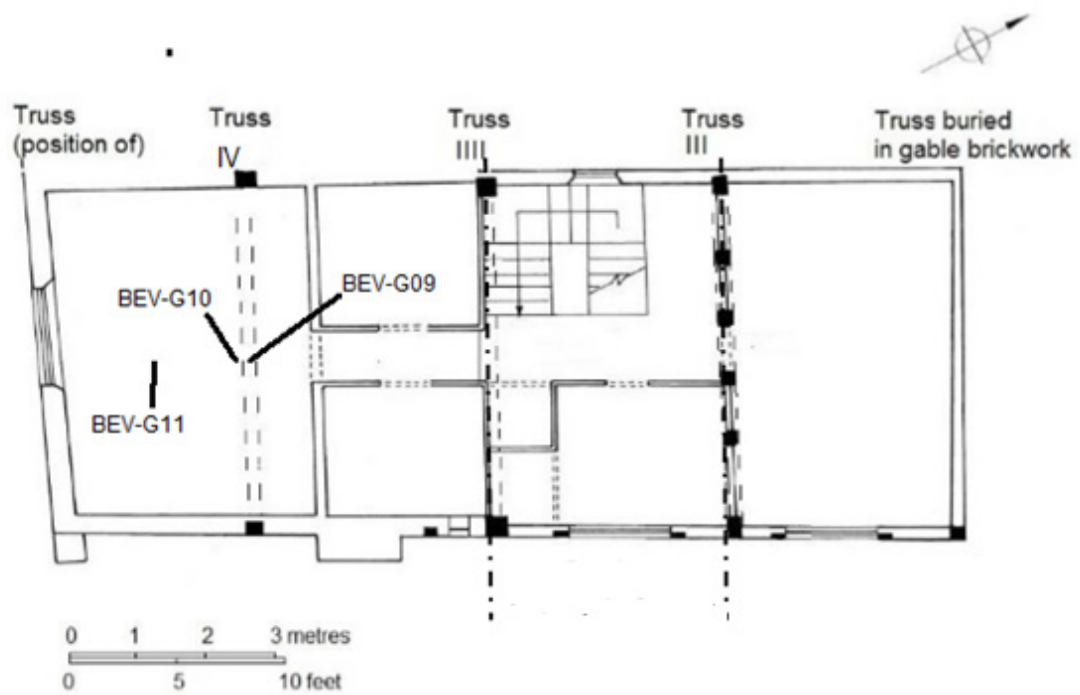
First-floor plan, showing truss positions and the location of samples BEV-G09–11 (YVBSG 2015 based on Ed Dennison Archaeological Services Ltd 2008)
